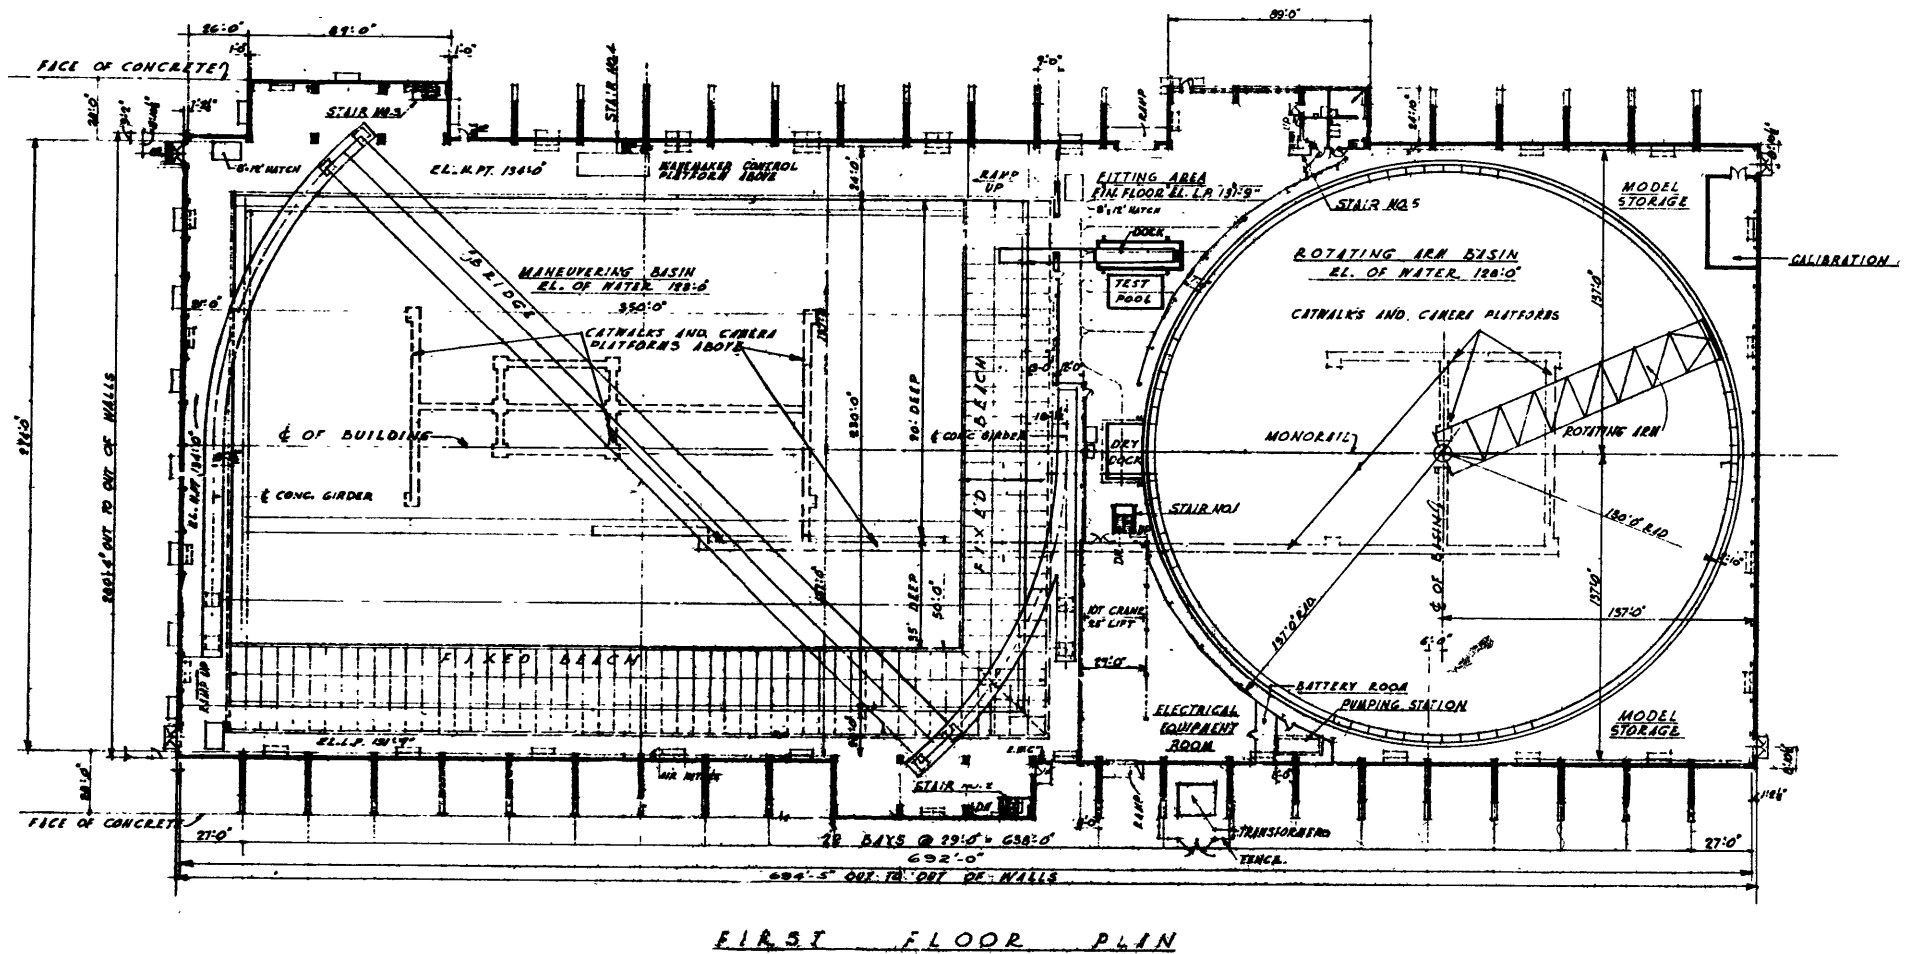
Rotating Arm and Maneuvering Basin - Floor Plans
